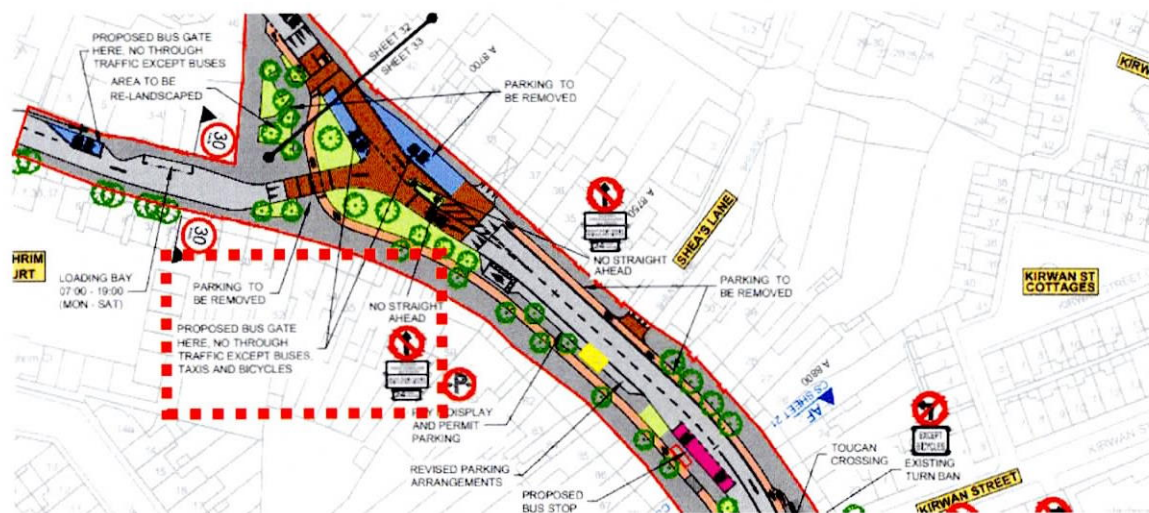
Extract from Sheet 33 of the General Arrangement drawing illustrating the proposed bus gate (red dashed line) at the junction of Prussia Street and Aughrim Street.
